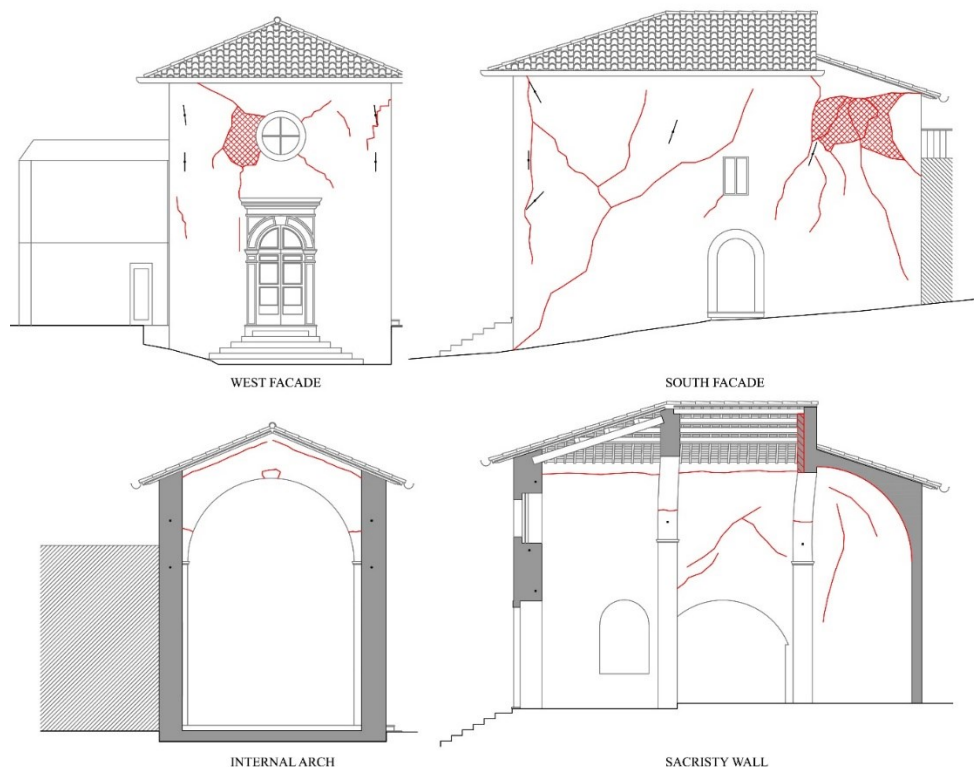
Damages observed on the south and west facades (up). Cracks detected on the internal arch and sacristy wall (down).
